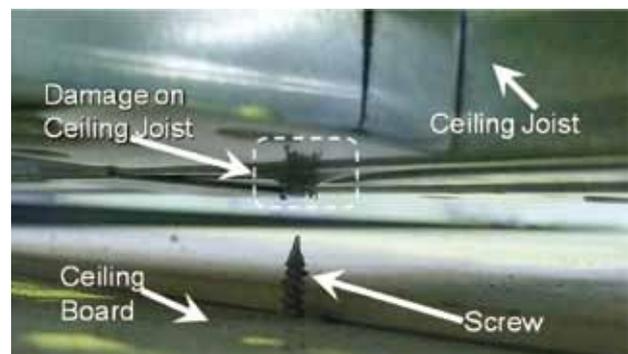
Vertical displacement of Ceiling Panel and Ceiling Joist
